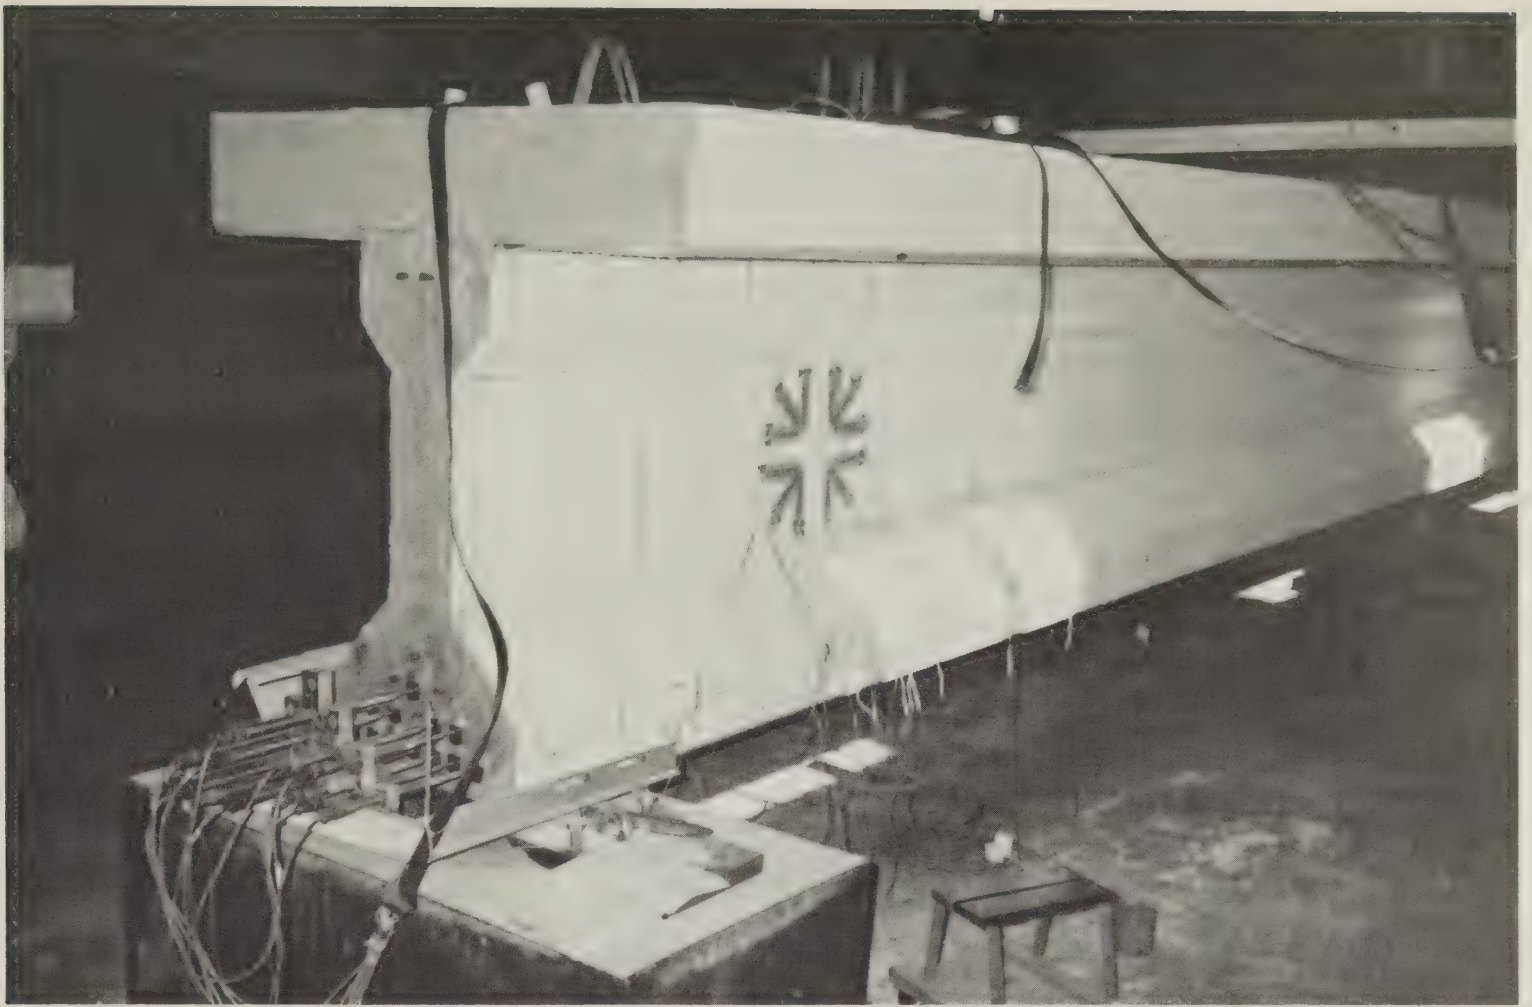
AASHTO Type II prestressed concrete I-girder prior to the start of development length experimentation.
